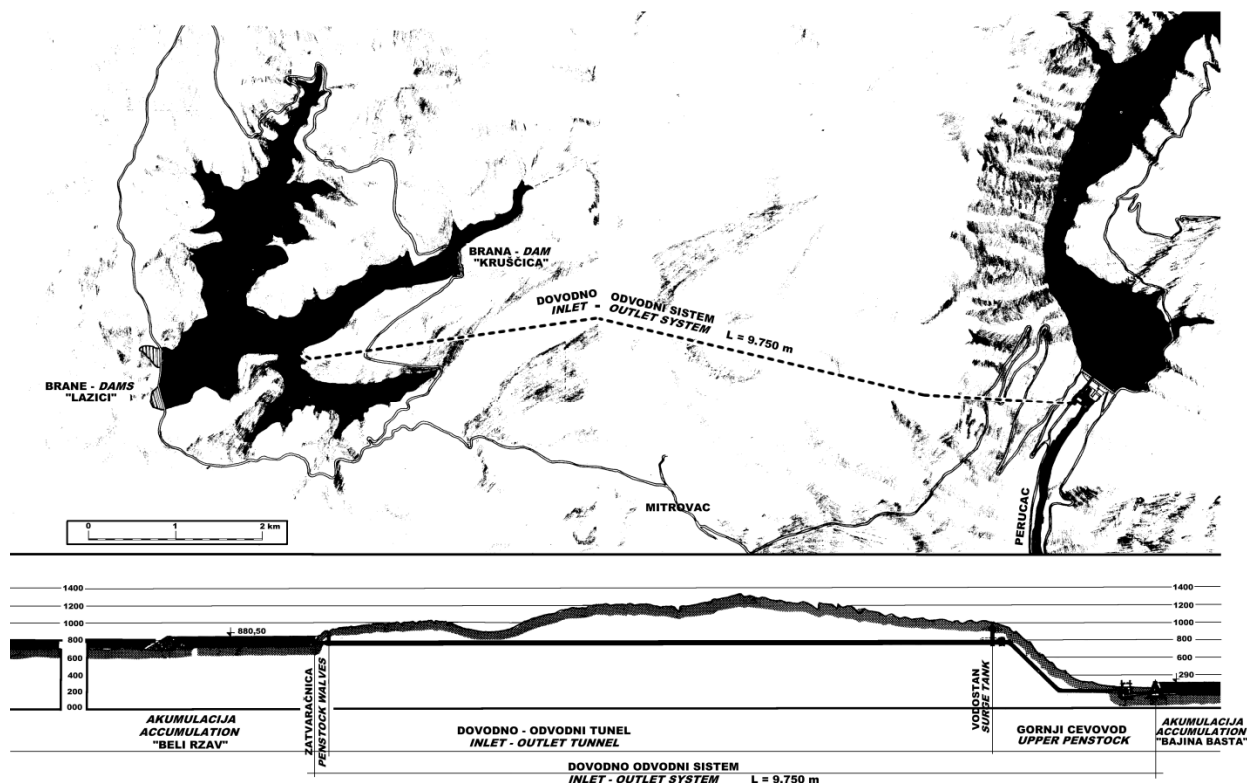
Upper and lower accumulation and inlet-outlet system of hydroelectrical power plant "BajinaBašta".
